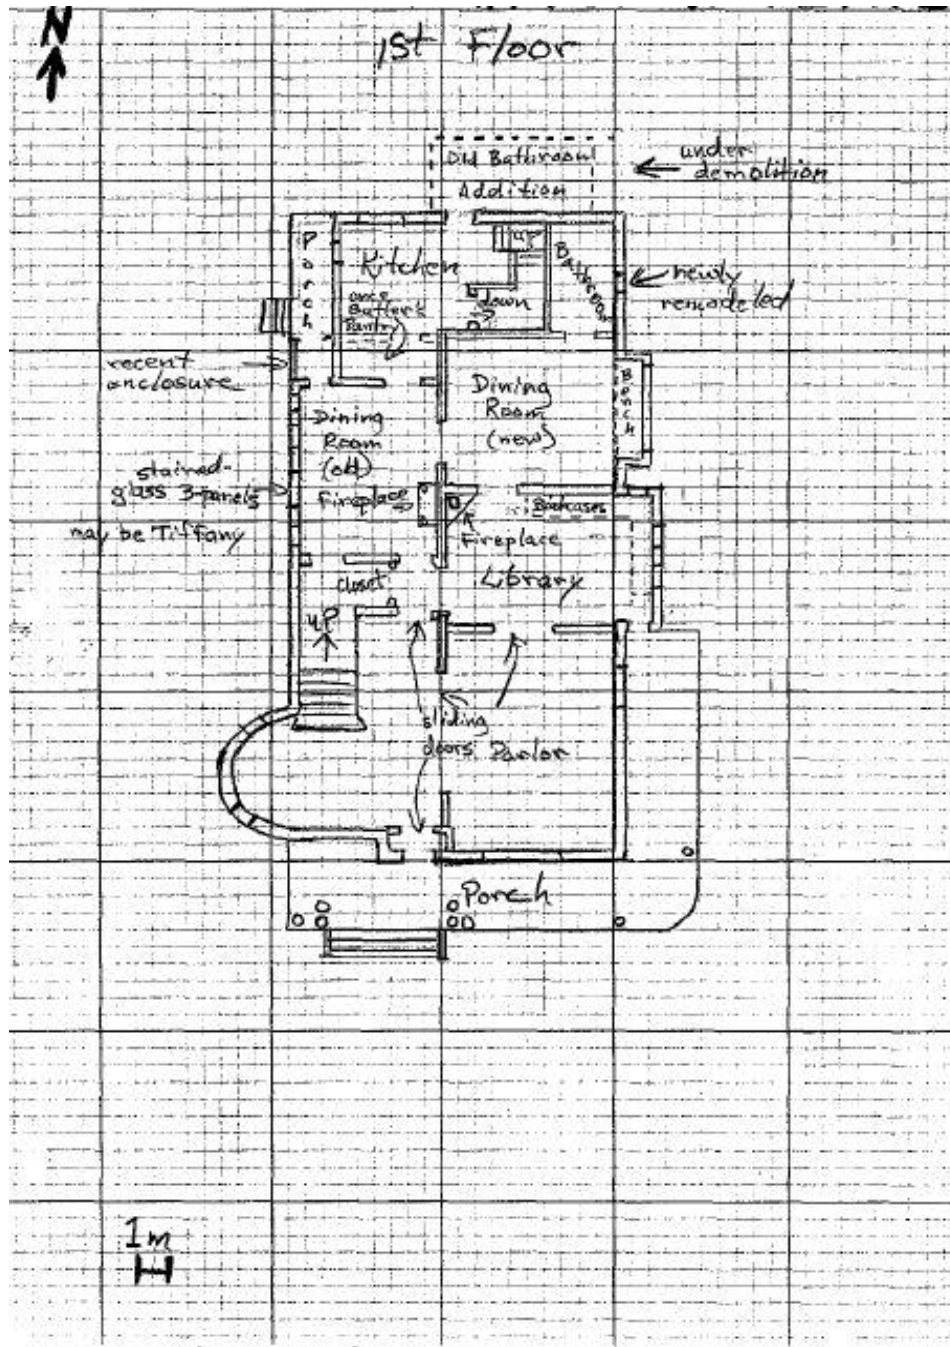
Harry V. Temple House, Floor plan, first floor, prepared by Russell A. Czaplewski, 1985 (NeSHPO Site Files, DS07-021)
